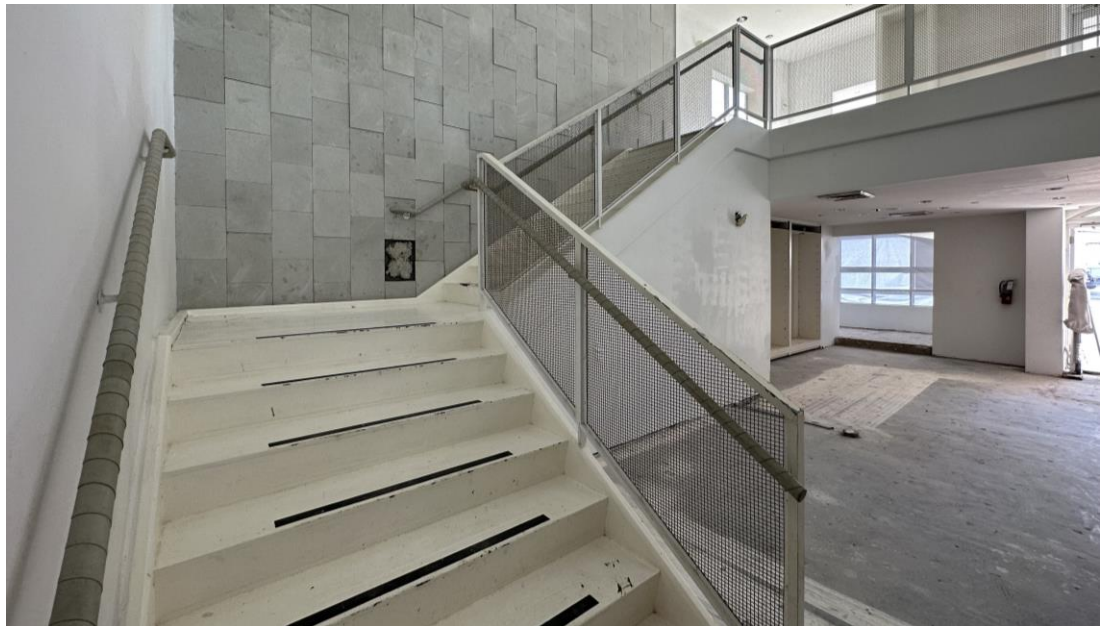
EXHIBIT (E): INTERIOR OF THE BUILDING (MAIN HALL) / PHOTO TAKEN: June 20, 2023
